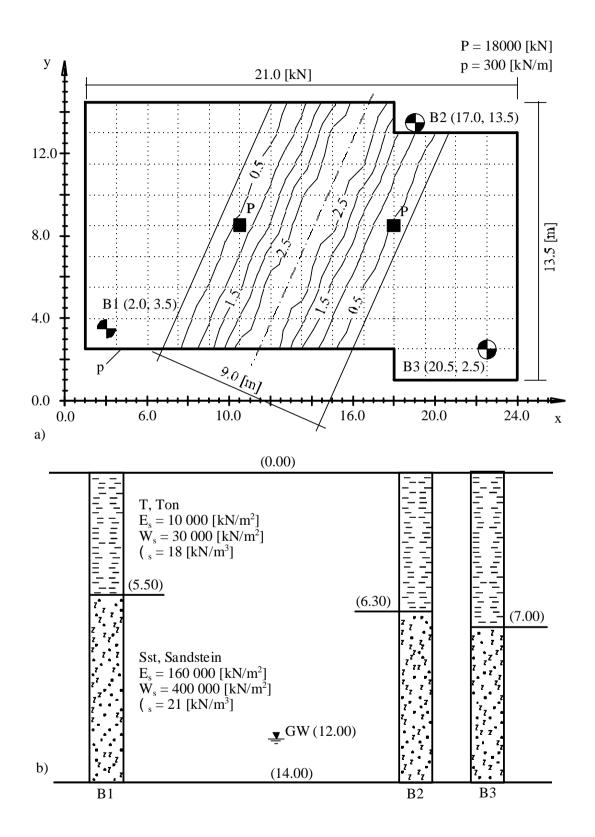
a) Plan of the raft with settlement lines through the underground tunnel and boring points b) Boring logs BPN1 to BPN3
